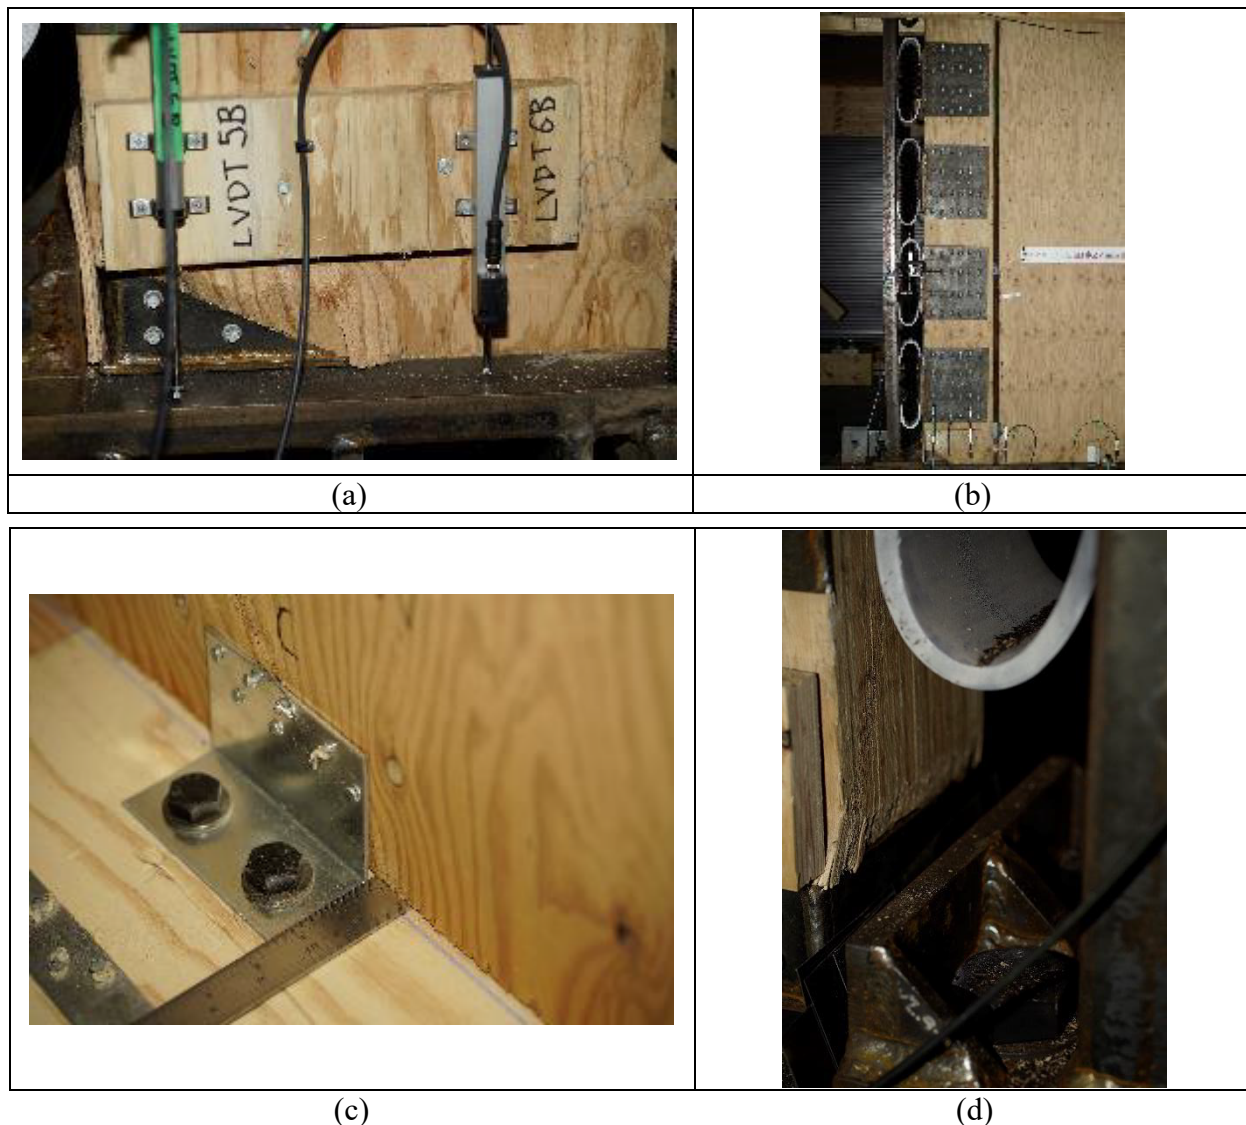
Damage observed in Phase 2: (a) Crushing at bottom corners of rocking panel; (b) deformation of steel side columns and UFPs; (c) nail damages and wall sliding at a bottom bracket connection between out of plane wall and diaphragm panels; and (d) mill scale at the bottom of the UFP.
